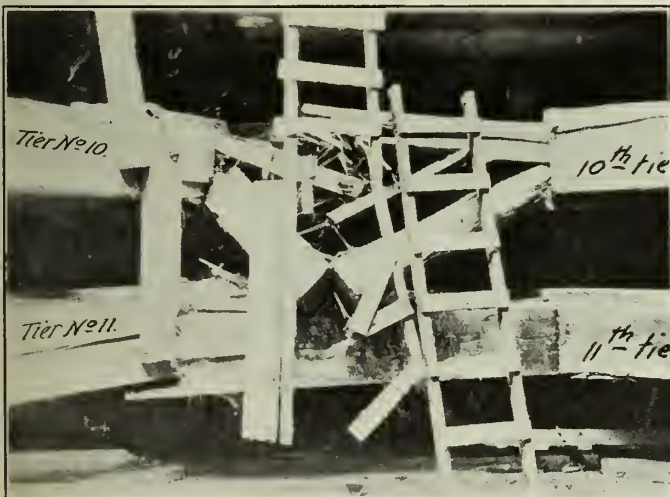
View Showing Failure of Timbers in Pit H, August, 1927.
